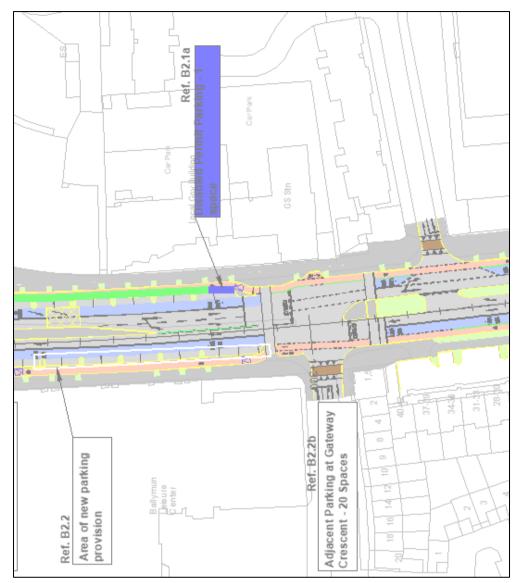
Proposed scheme design and parking changes along Ballymun Road (Between Shangan Road junction and Collins Avenue junction).
